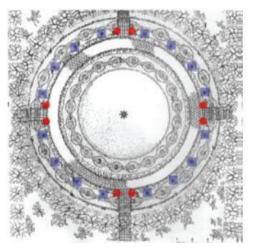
Plan of the Rotunda – 16 statues a 8 columns appearing on the plan (Marcus R., 1958)
